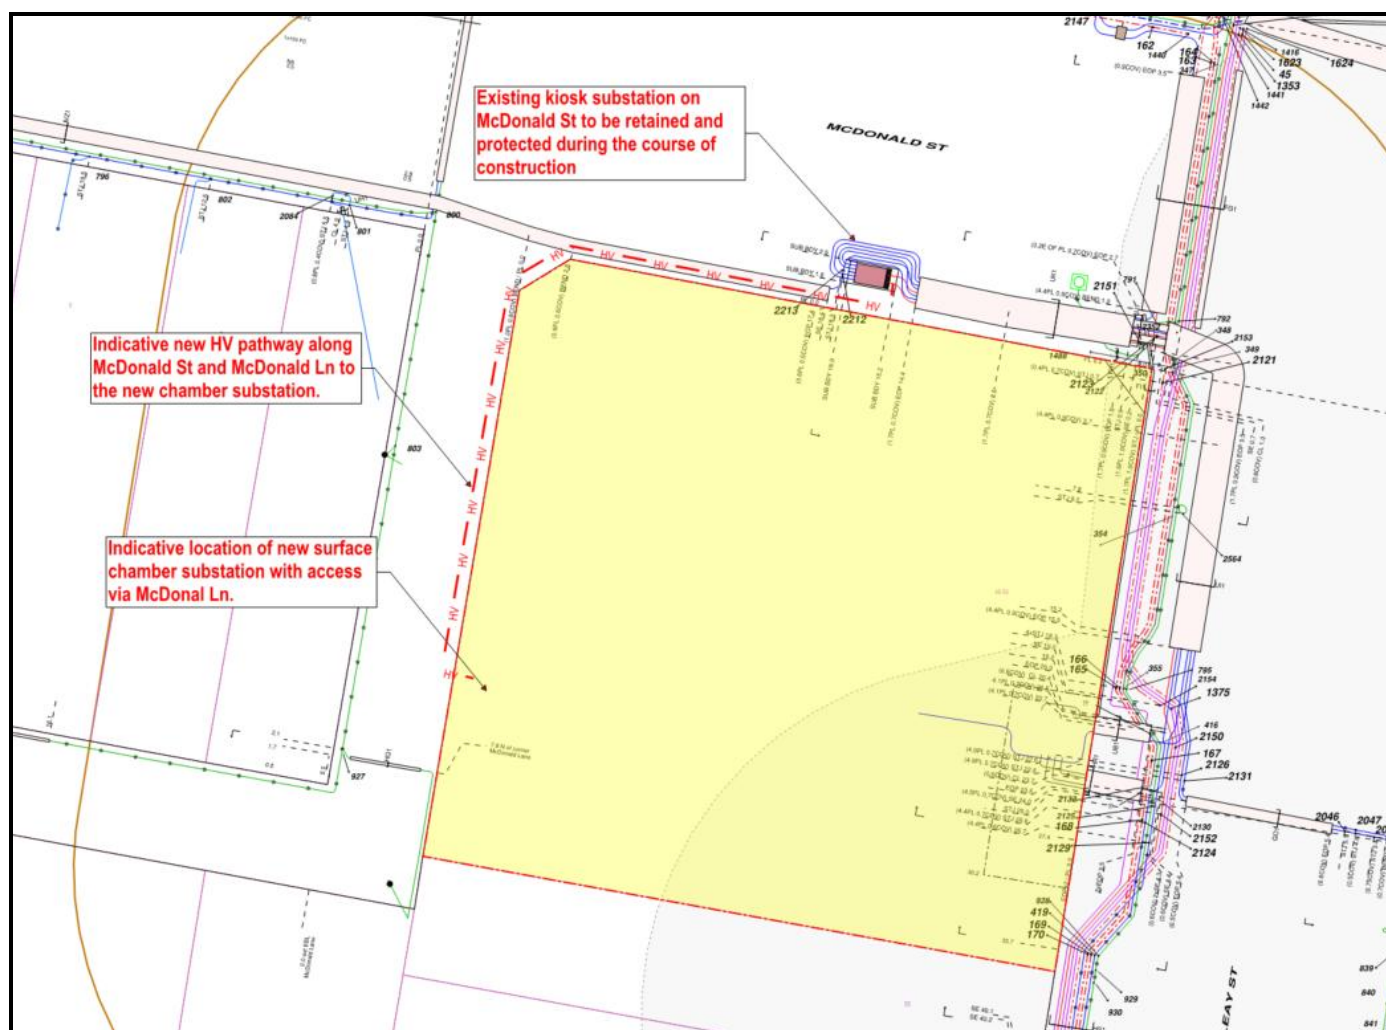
Network Plan Within the Vicinity of The New Development Site (Source: DBYD)
